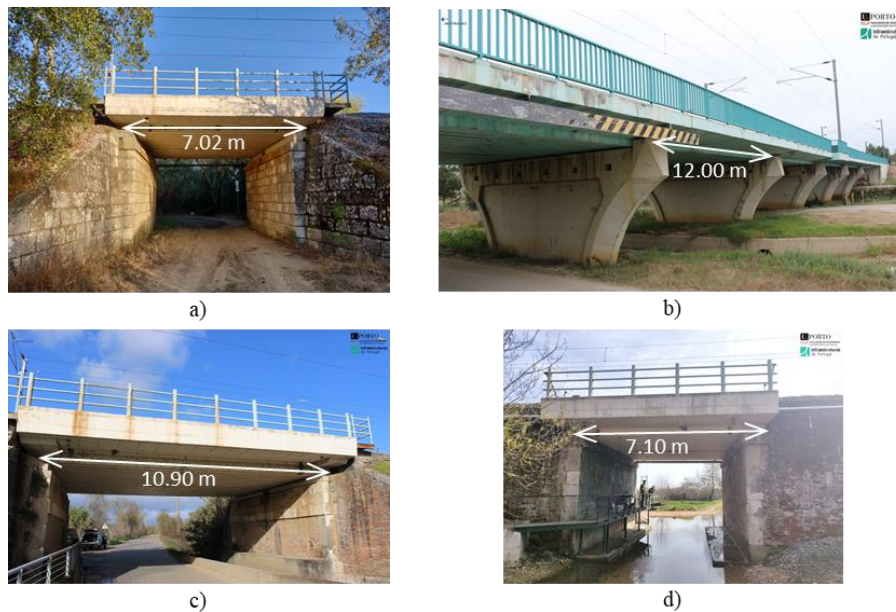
Railway bridges: a) Braço do Cortiço underpass; b) Canelas bridge; c) Cascalheira underpass; d) Vale da Negra underpass
